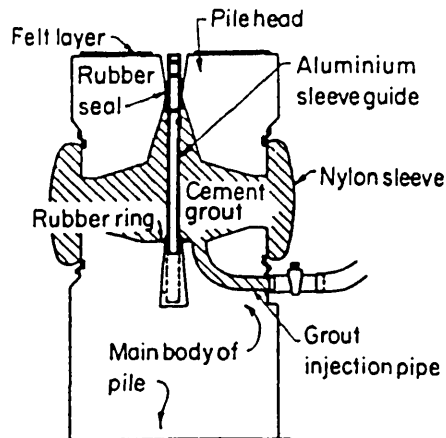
Grouting of foundations to compensate settlement of structures (after Tomlinson, 1984).
